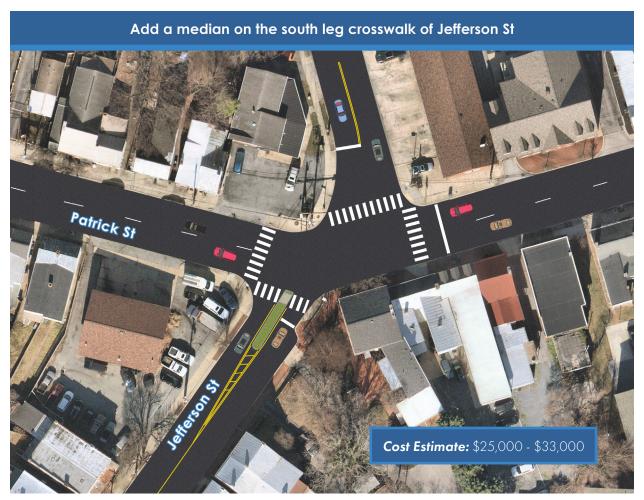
Proposed Improvements for Jefferson St and Patrick St Intersection
